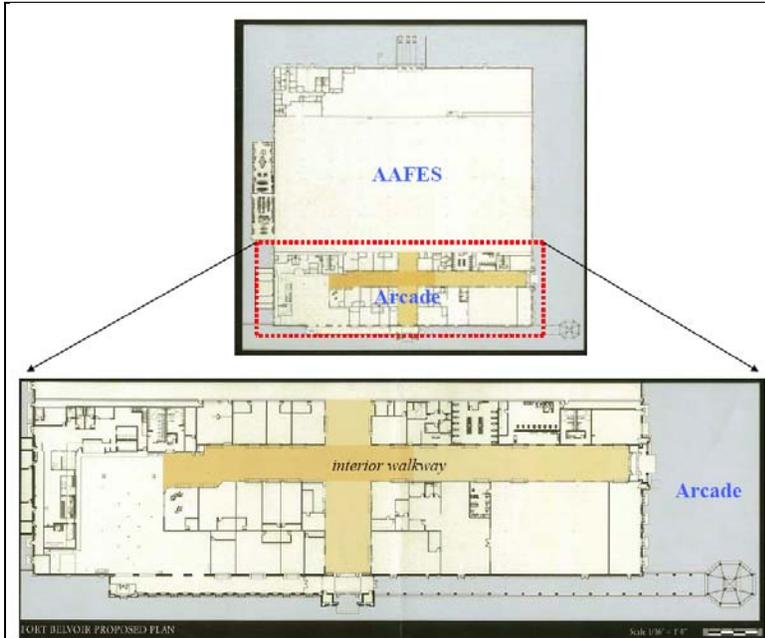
Proposed Post Exchange Shopping Center Floor plan
